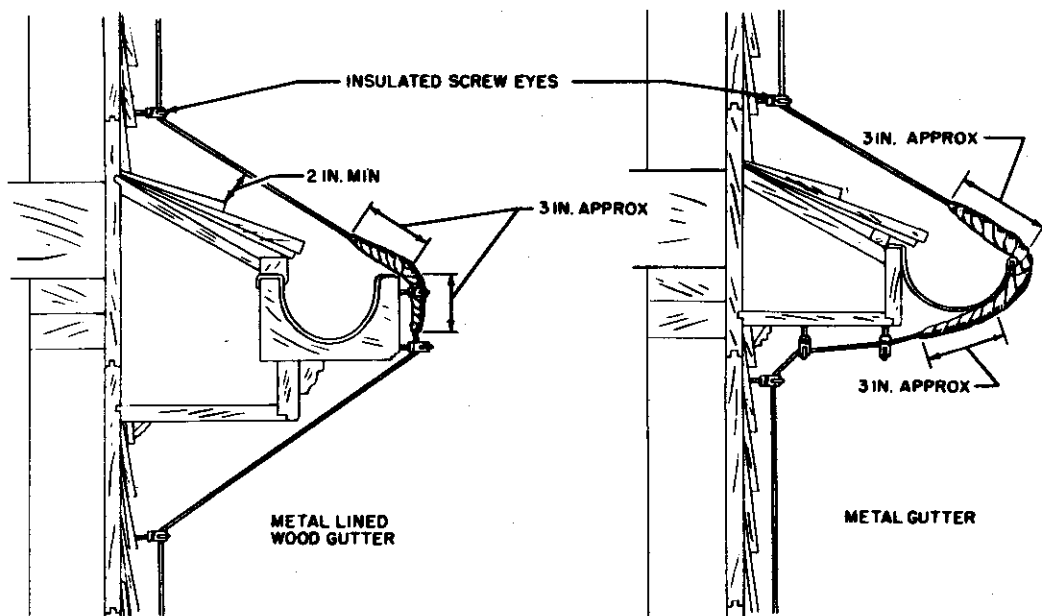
Typical Mechanical Protection at Overhang or Gutter
